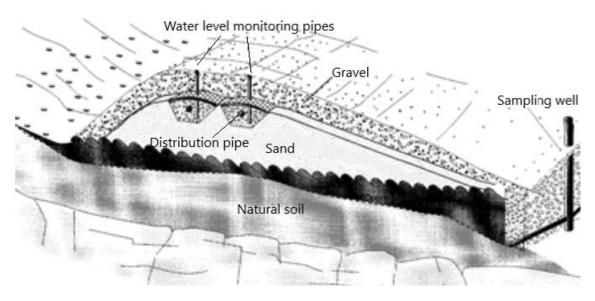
Design of an infiltration trench (Jenssen & Heistad, 2000)
